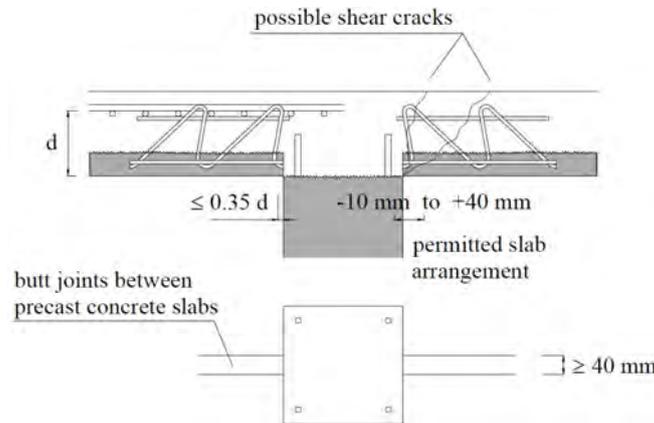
Permissible arrangement of the Filigran®-Punching Shear Reinforcement and precast slabs adjacent to the column⁵
